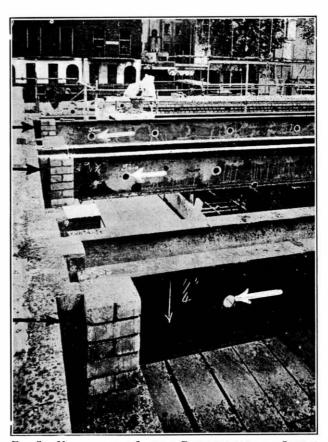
University of London Building showing Cavity Risers and Holes for Conduits.
